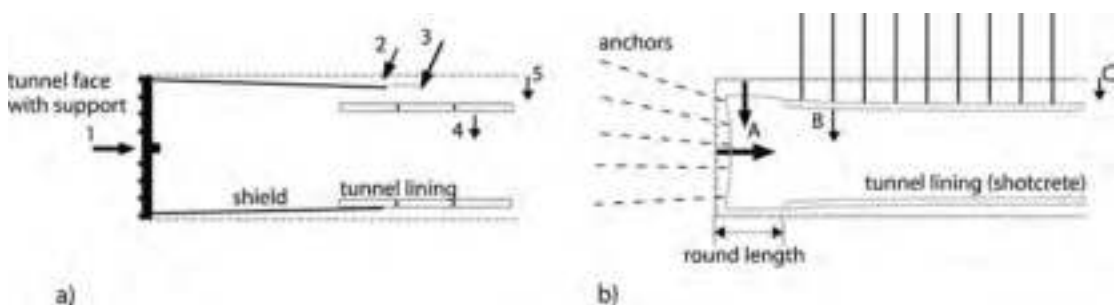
Principal components of ground deformation: a) Closed shield tunneling (after Mair and Taylor (1997)), b) open face tunneling
